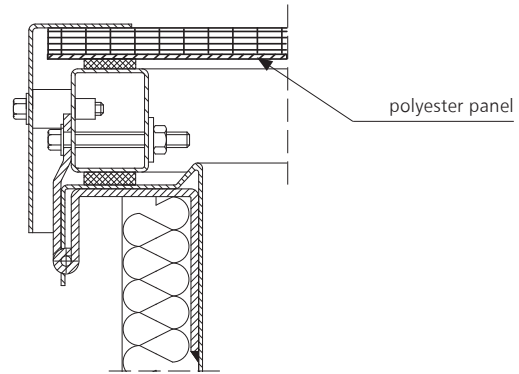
Vent section, glazing B_{ROOF}(t1)
